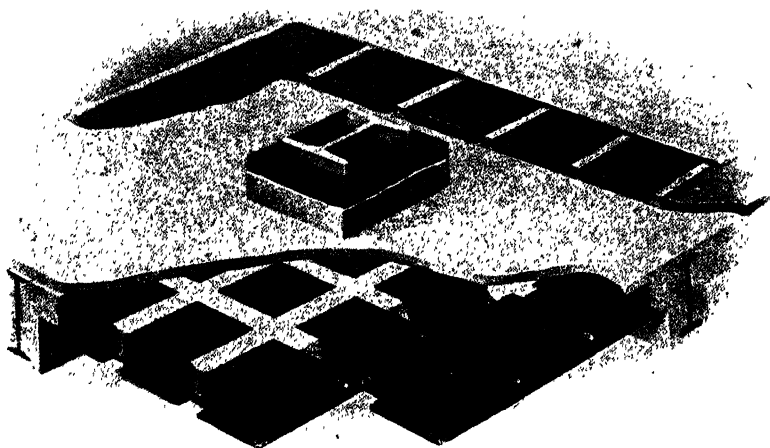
Details of Two-Way Hollow Tile Floor Slab and Structural Steel Column Fireproofing. (See p. 629.)
